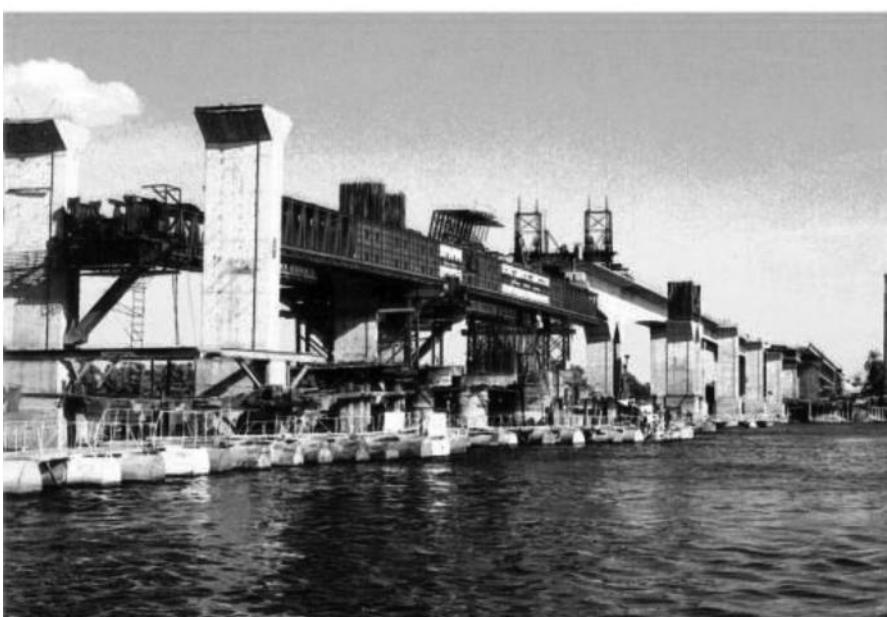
Movable scaffolding adopted during Luxor Bridge construction.
